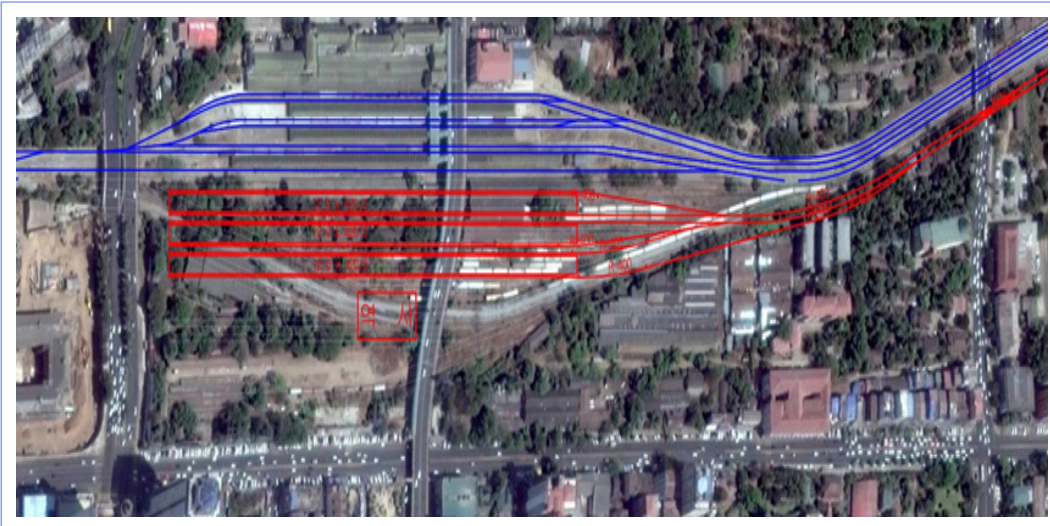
| Plan to Share the Existing Yangon Station for the HSR & the MG Track (Alt 1)
